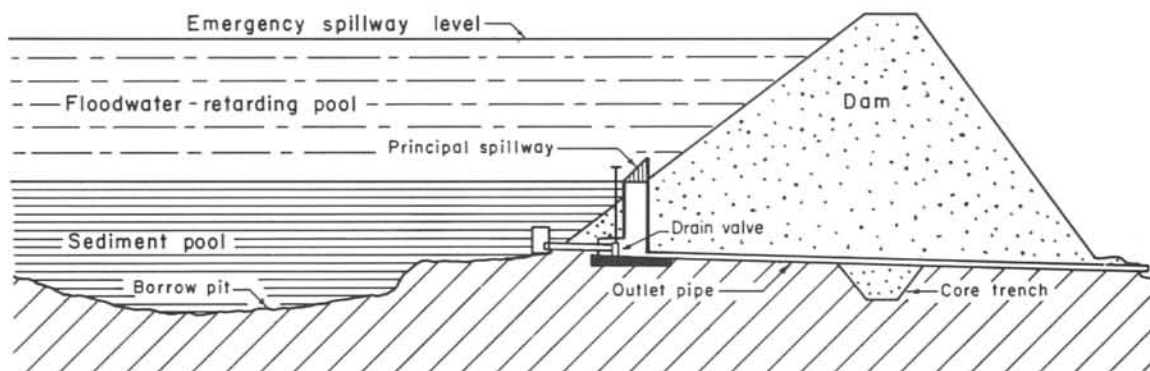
Section of a Typical Floodwater-Retarding Structure
